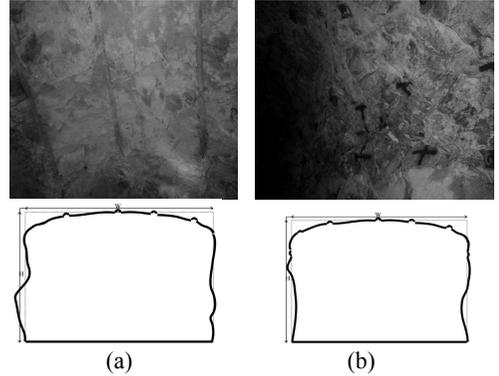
Half-barrel profiles around the opening: (a) typical roof profile when pyrotechnic delay detonators were used; (b) typical roof and top side of wall profile when electronic detonators were used.
